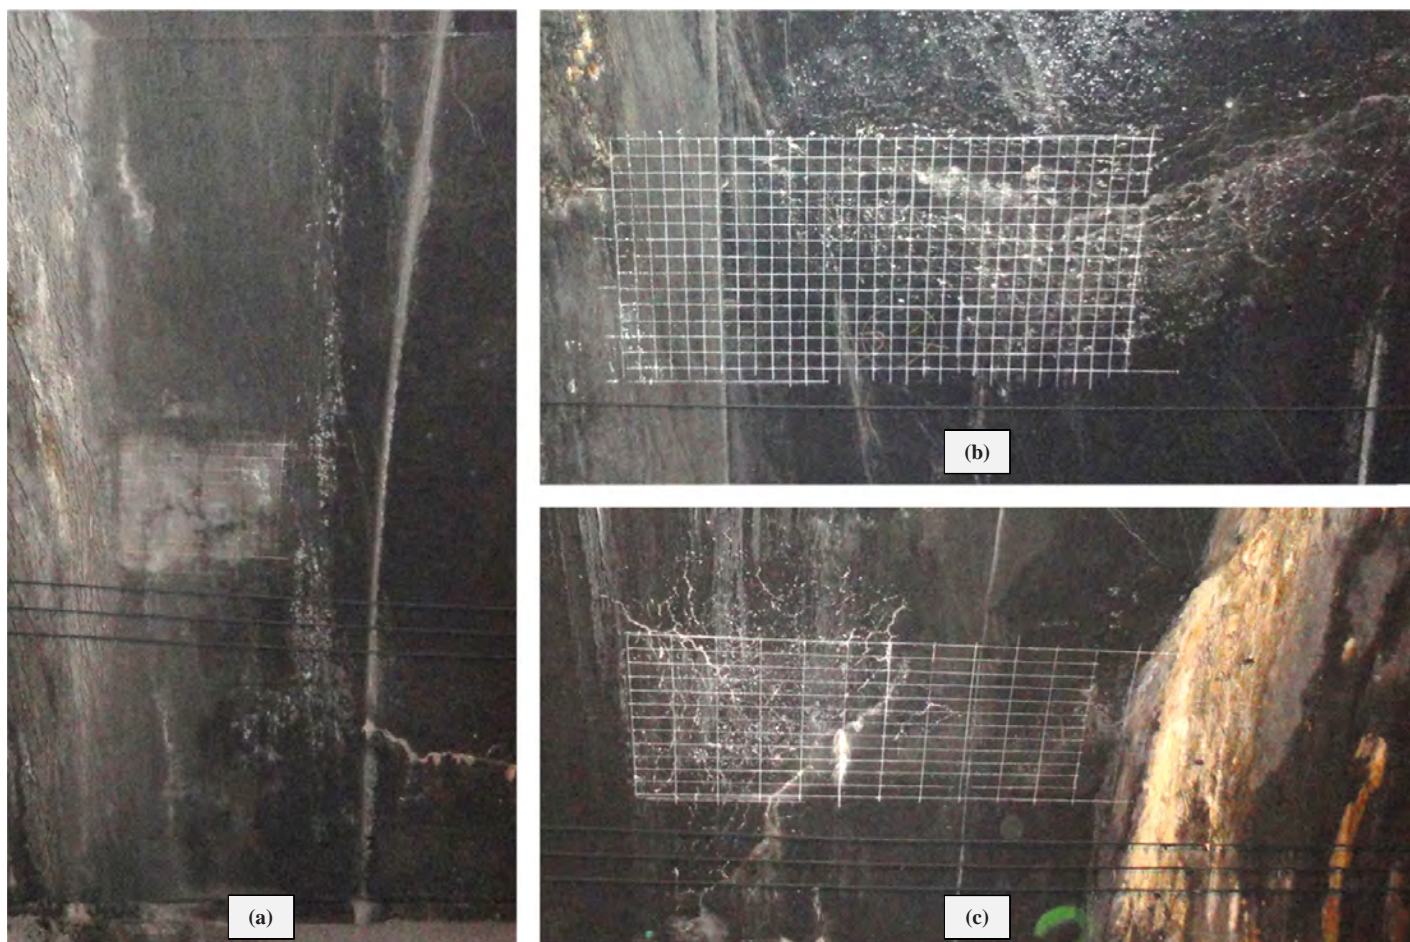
Scanned areas within Eisenhower Memorial Tunnel: (a) sound concrete, (b) surface cracking and crazing near joint, and (c) surface cracking and crazing near joint and crack with stalactite formation.
